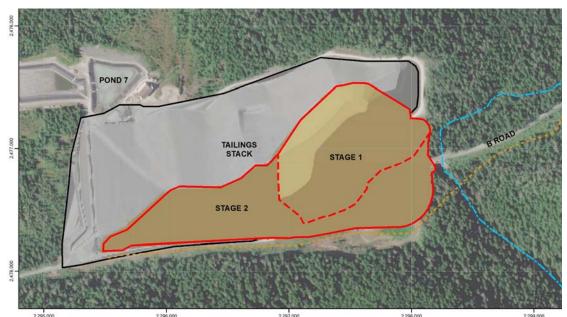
, Conceptual Tailings Stack Layout by Stage (Infrastructure Changes Not Shown)
